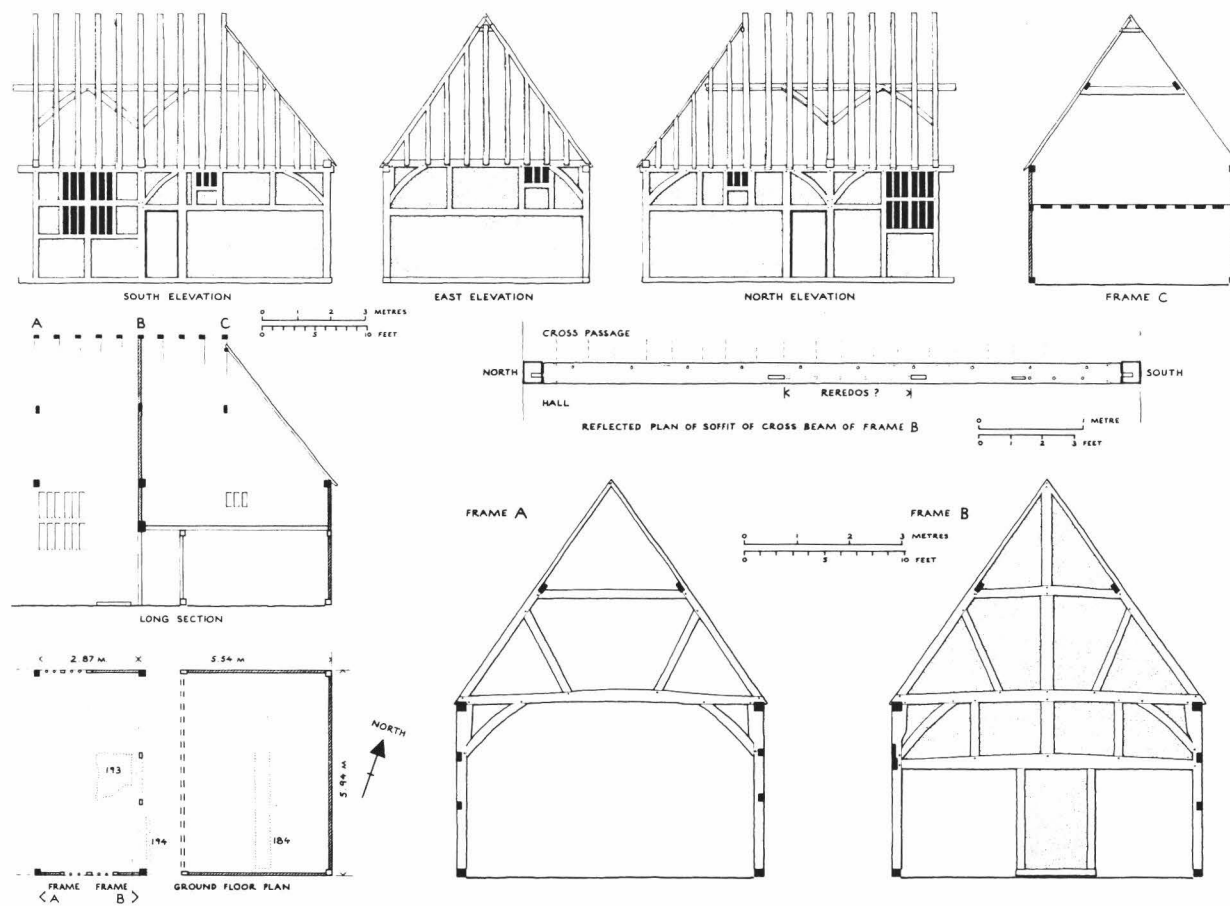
Period 2b: The timber-framed building. Frames are shown reconstructed as far as the evidence allows. In the ground floor plan the archaeological layer numbers are shown.
